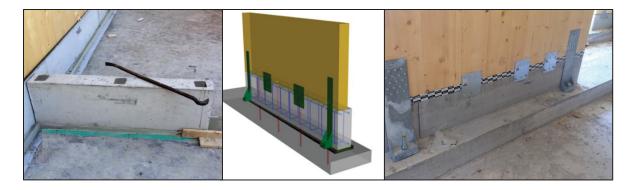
Concrete beam foundation system Taken from Canetti et al. (2023, p. 1418)
